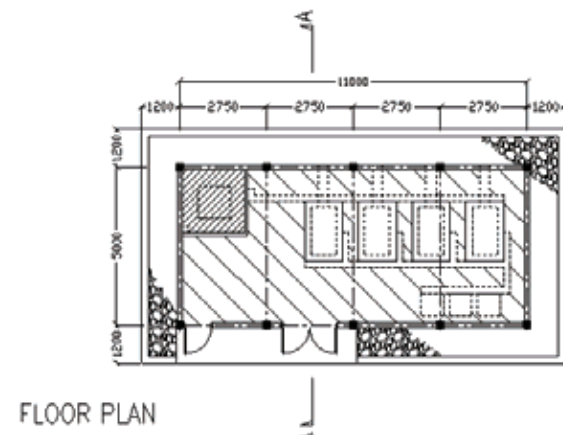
Plot Plan of Facilities (5) Tanjung Parit
